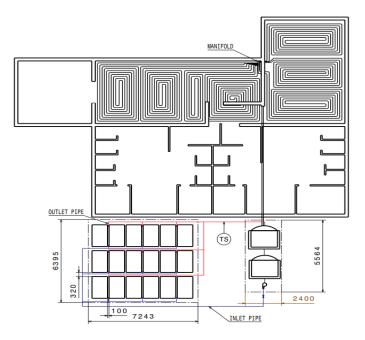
Planned Layout of Solar Underfloor Heating System
